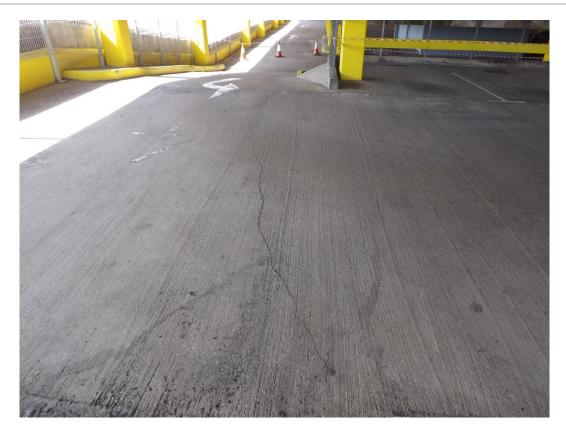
Typical instance of cracked deck soffit.
